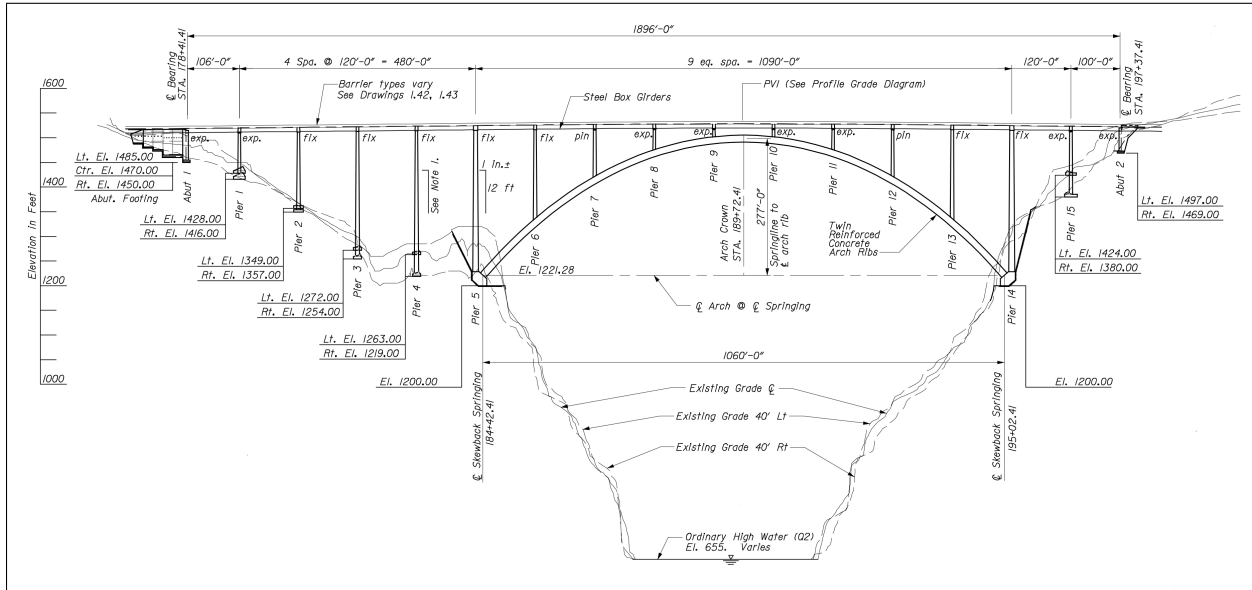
Elevation: The Hoover Dam Bypass Colorado River Bridge(US 93)
